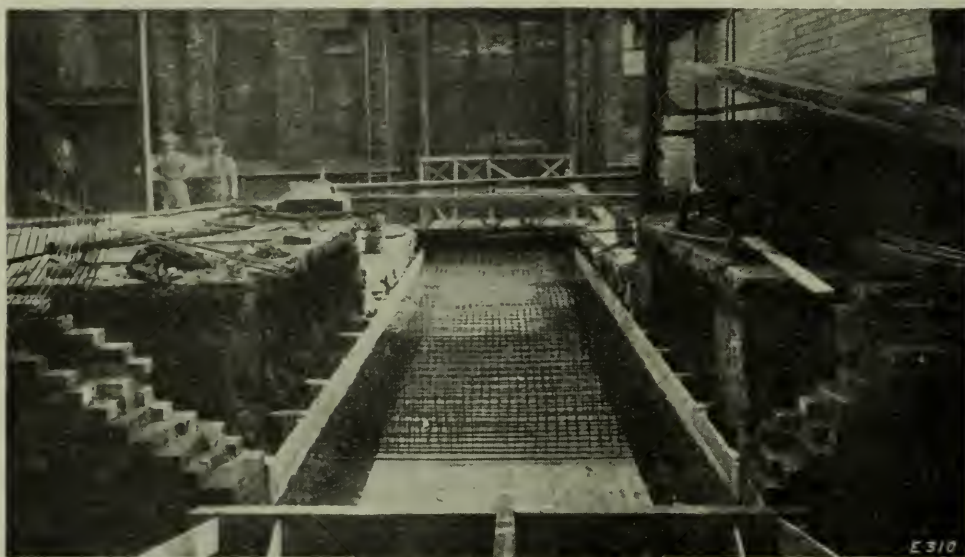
B.R.C. STIRRUP IN REINFORCEMENT OF ROOF SLAB OVER SUBWAY FOR THE IMPERIAL TOBACCO CO., LTD.
